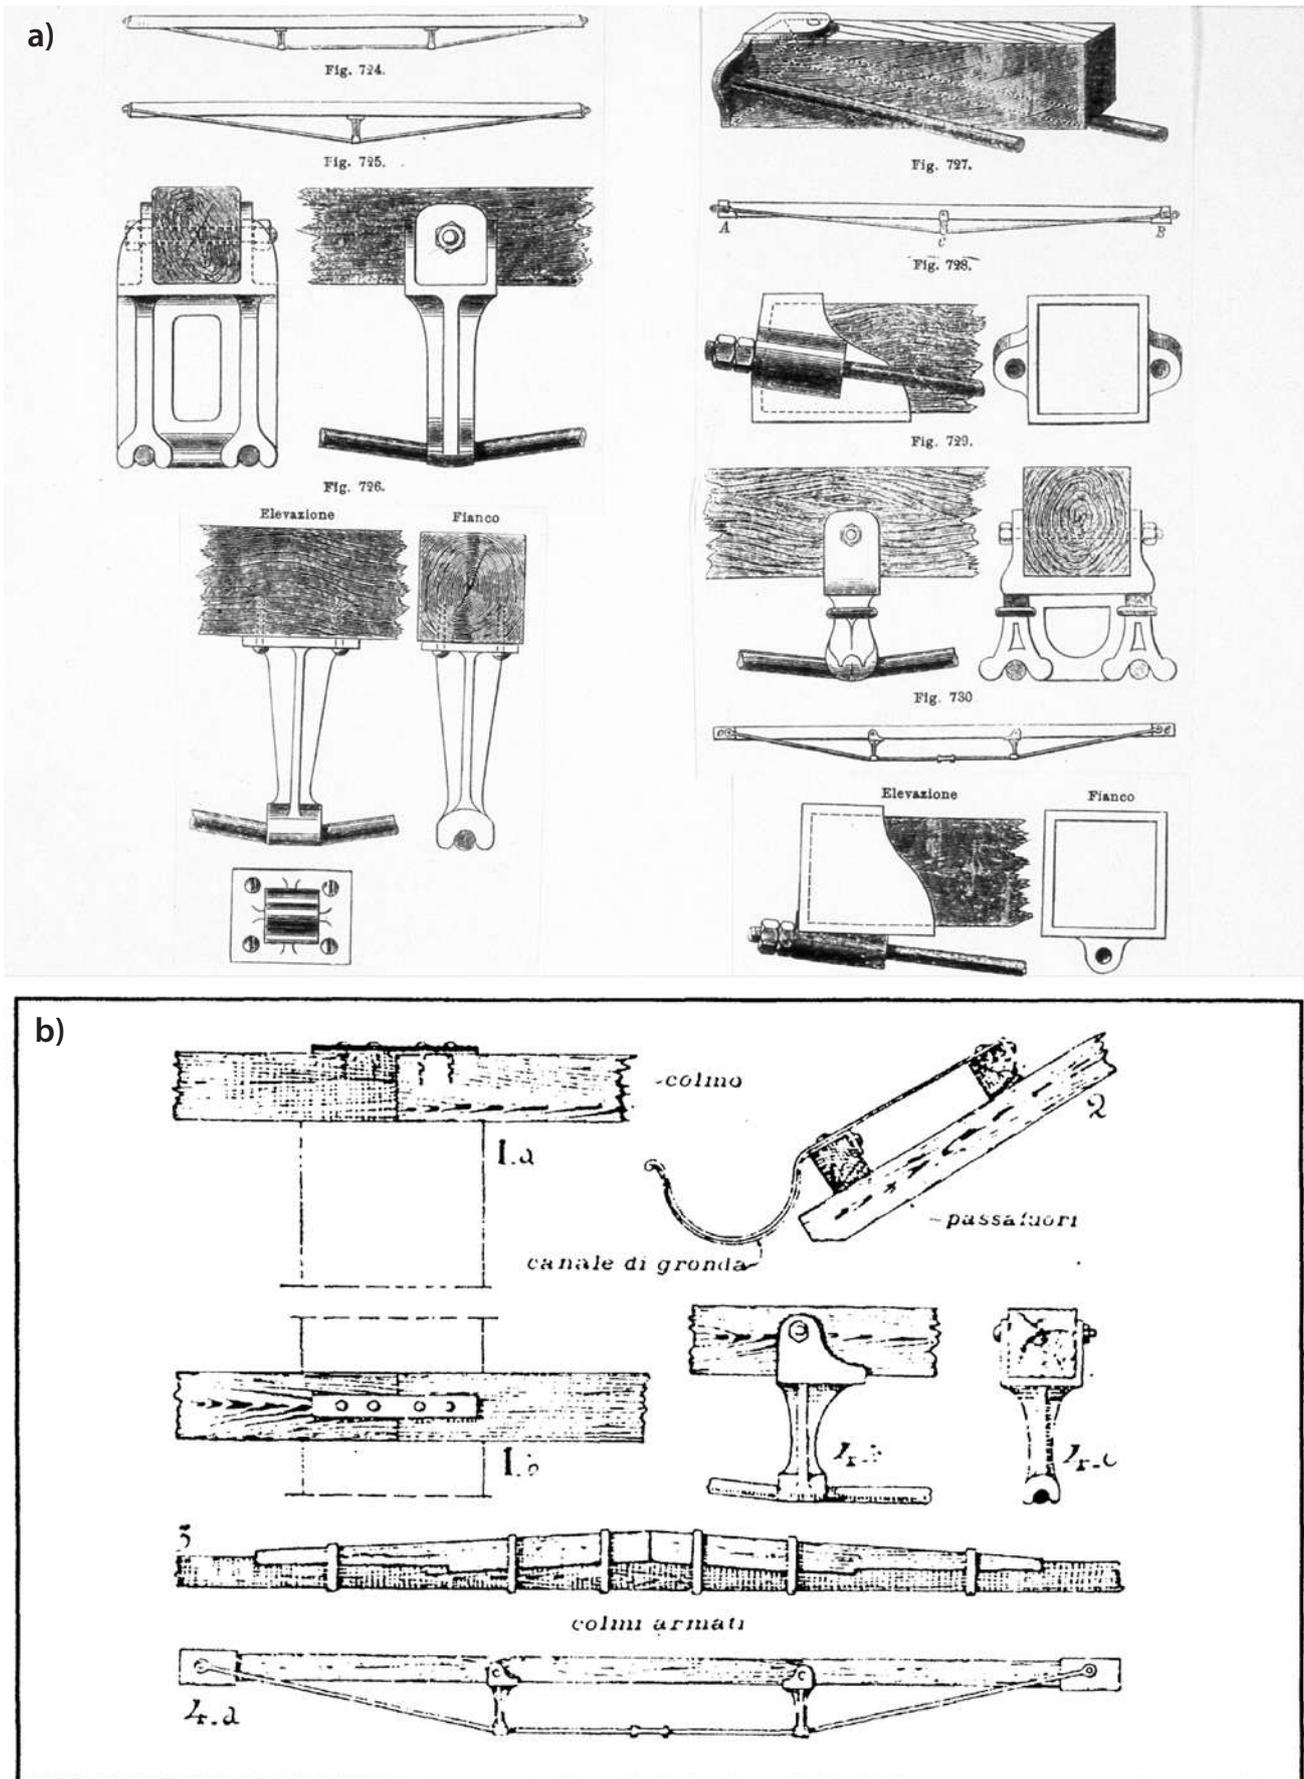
(a) Reinforced beams with one or two struts and details of the tie rods and struts in cast-iron, from Pareto, Sacheri, 1889 [39, Vol. VI, Part II-43, Cerriana S (ed) headword "Solai e soffitti", pp 330–331]; (b) reinforced ridge beams, from Chevalley, 1924 [8].
